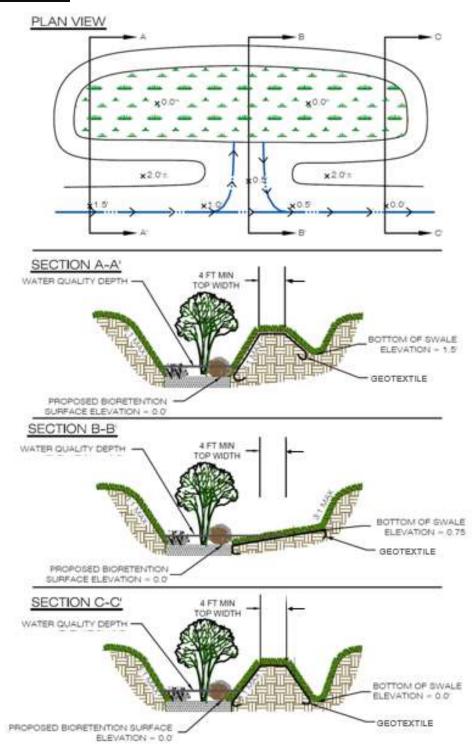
Typical Details for Off-Line Bioretention (source: VADCR, 2010, MWS edited 2020)
